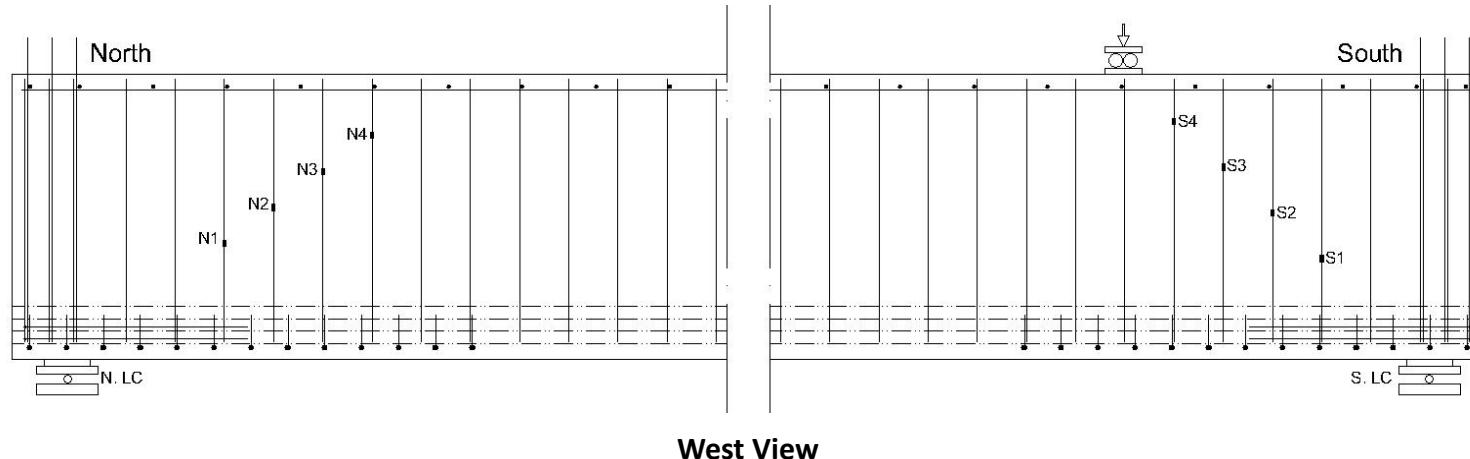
Layout of Strain Gauges on Transverse Reinforcement for Girder D2-South End Testing (Labib 2012)
